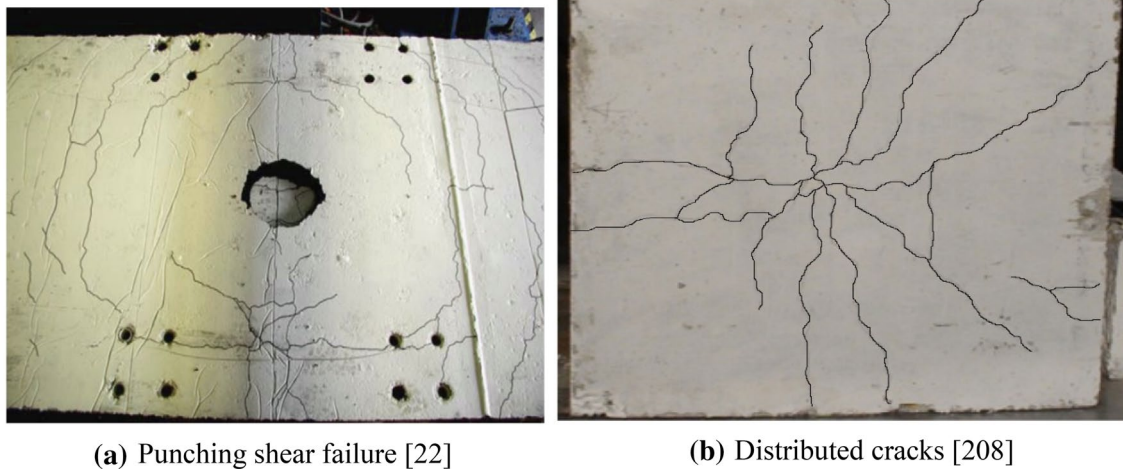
Typical failure modes of concrete slabs under different impact loads
